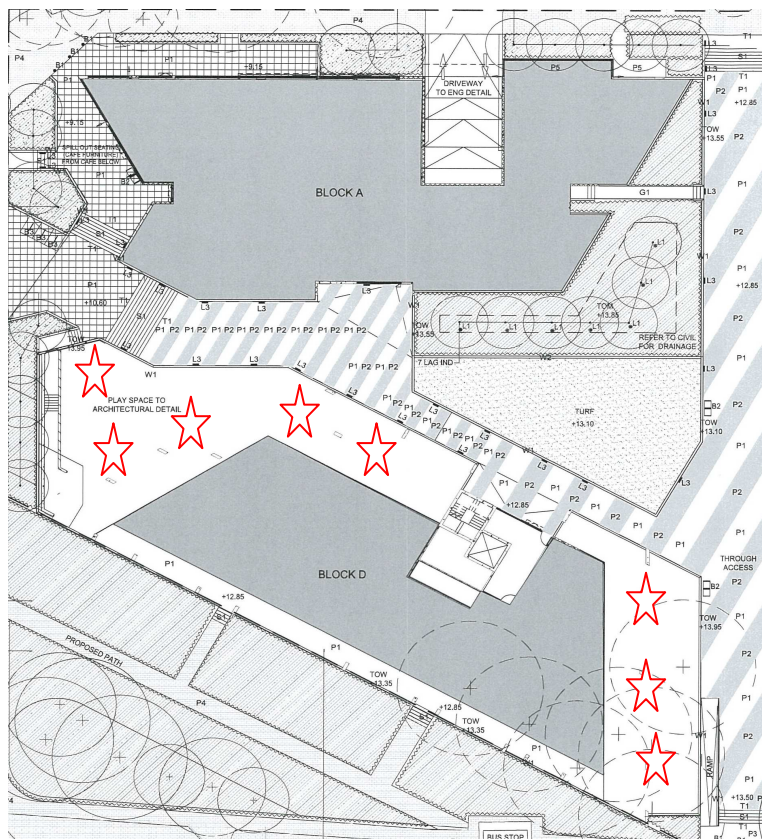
Section 96 plaza area demonstrating the location of the outdoor play area for the child care centre, the re-adjusted stairs and landscaped area
